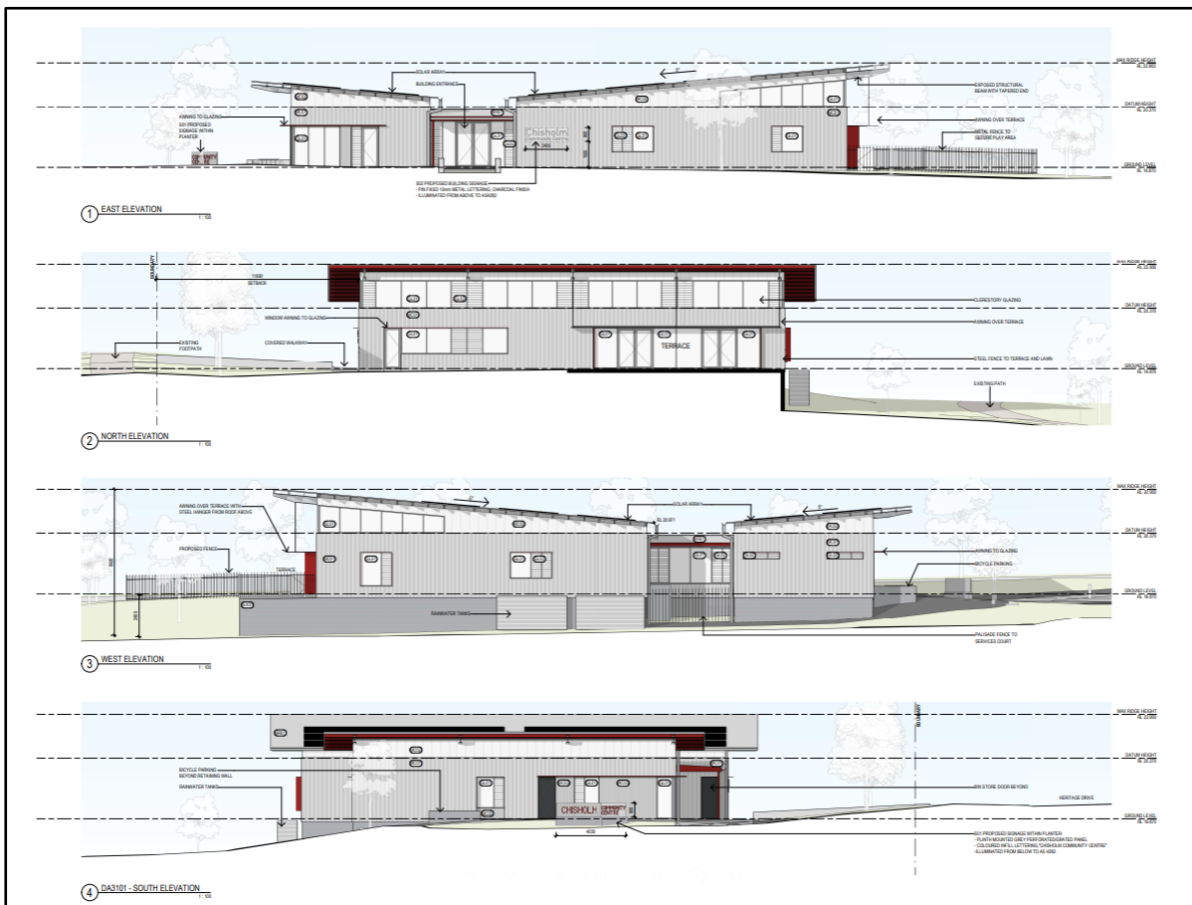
Elevations. Source: AJC Architecture dated 23 April 2024
